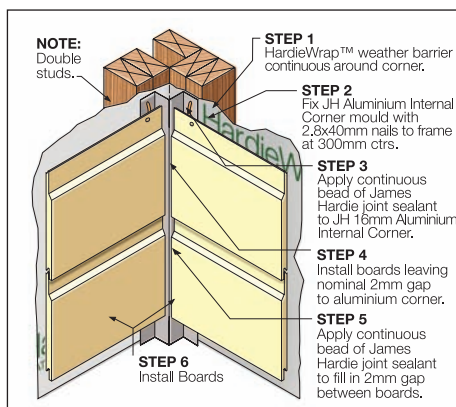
B ALUMINIUM 16MM CORNER DETAIL - SPLAYED PROFILE
